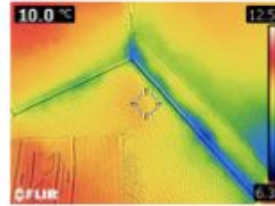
Figure B: Visible draughts/ cooler areas at ground floor skirting board.
